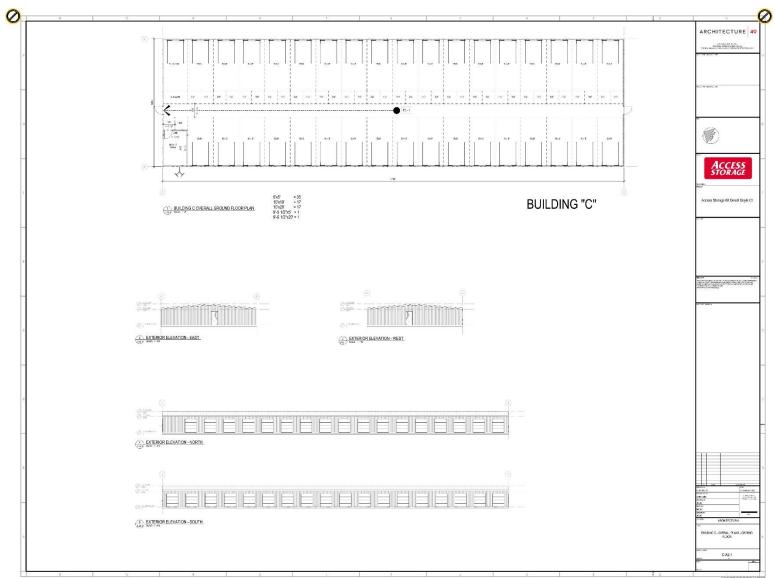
Proposed Building Elevations and Floor Plans – Building C (prepared by Architecture 49, dated November 11, 2022)
